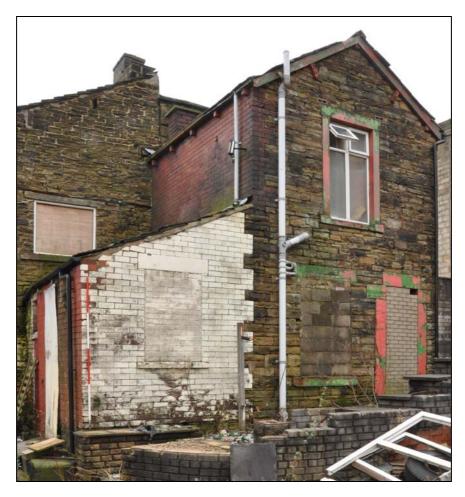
Building 1 (rear additions - phases 4 & 5), from the west
